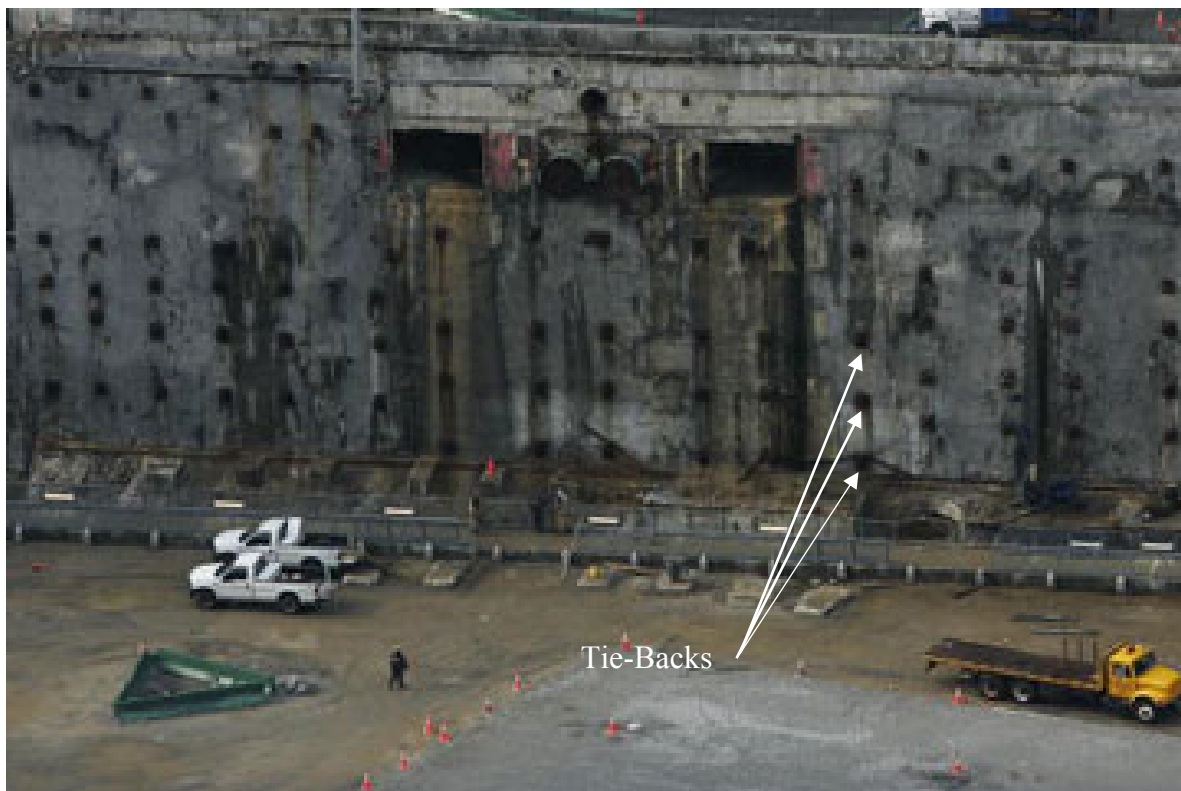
Structural Concrete Cutoff Wall for the World Trade Center
